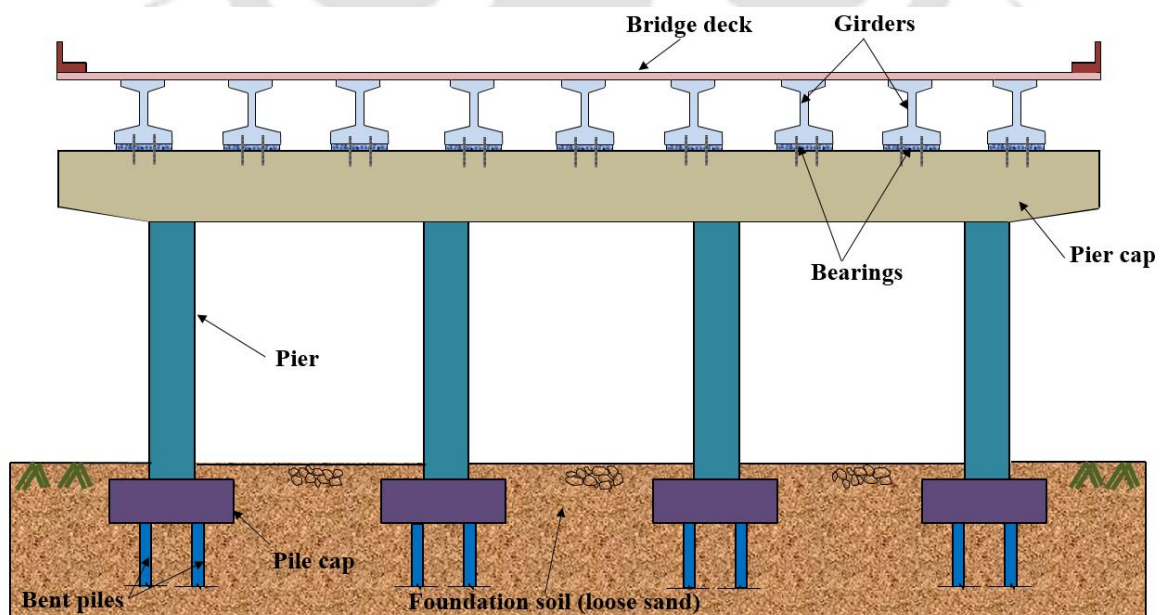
Typical configuration (elevation in the bridge transverse direction) of the multispan continuous integral abutment bridge adopted in the study.
